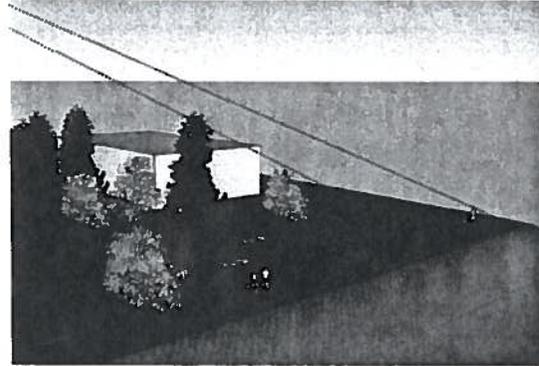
L-2b. Building heights shall not exceed one (1) foot in height for every four (4) feet of distance from a proposed or existing trail. The above image shows that a twenty (20) foot tall building would be required to be set back 80' from a trail centerline and thirty five (35) feet from a one hundred (100) foot wide open space corridor.
